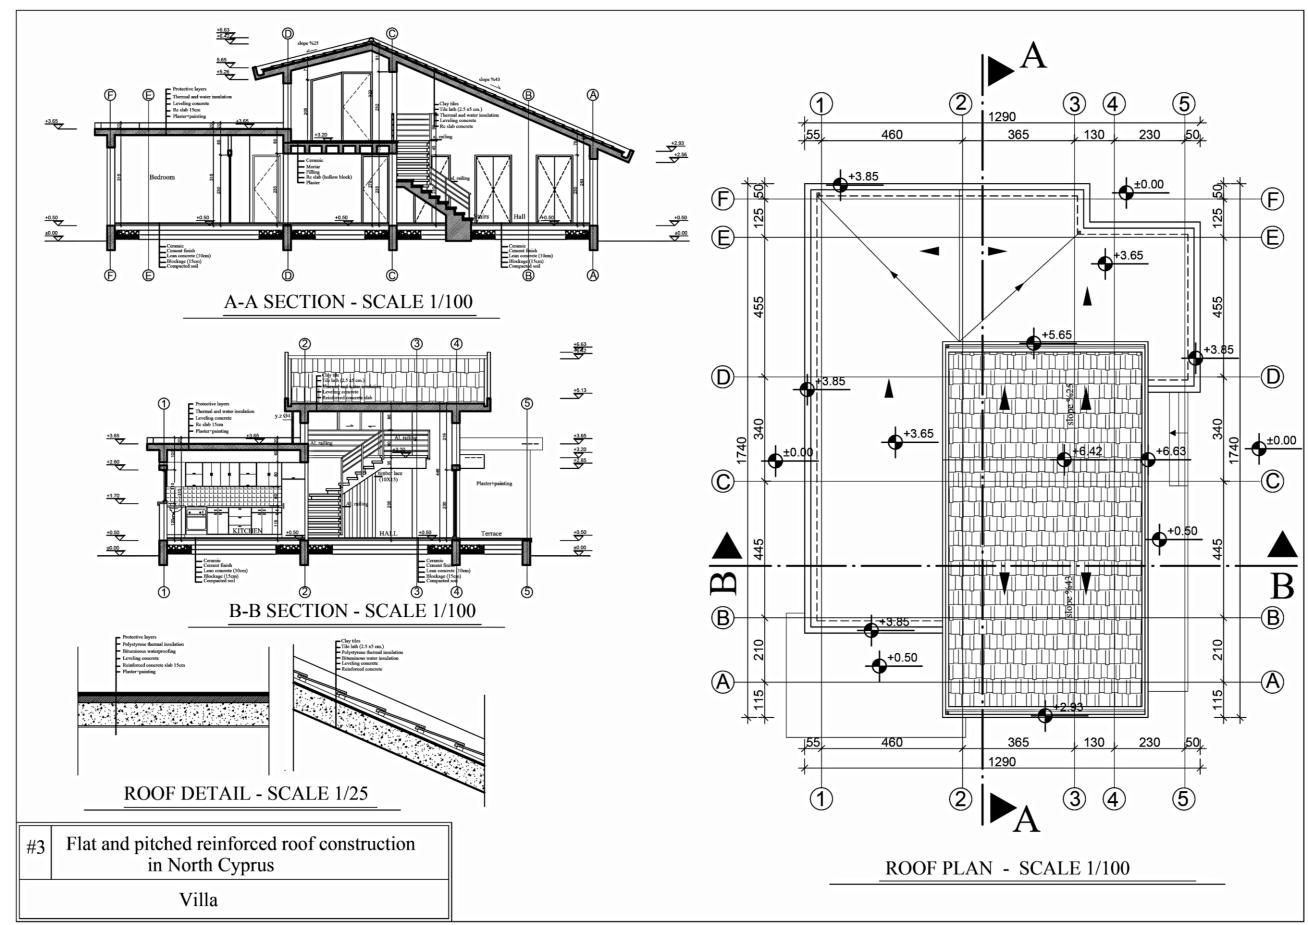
Inclined and flat reinforced concrete roof construction in North Cyprus
